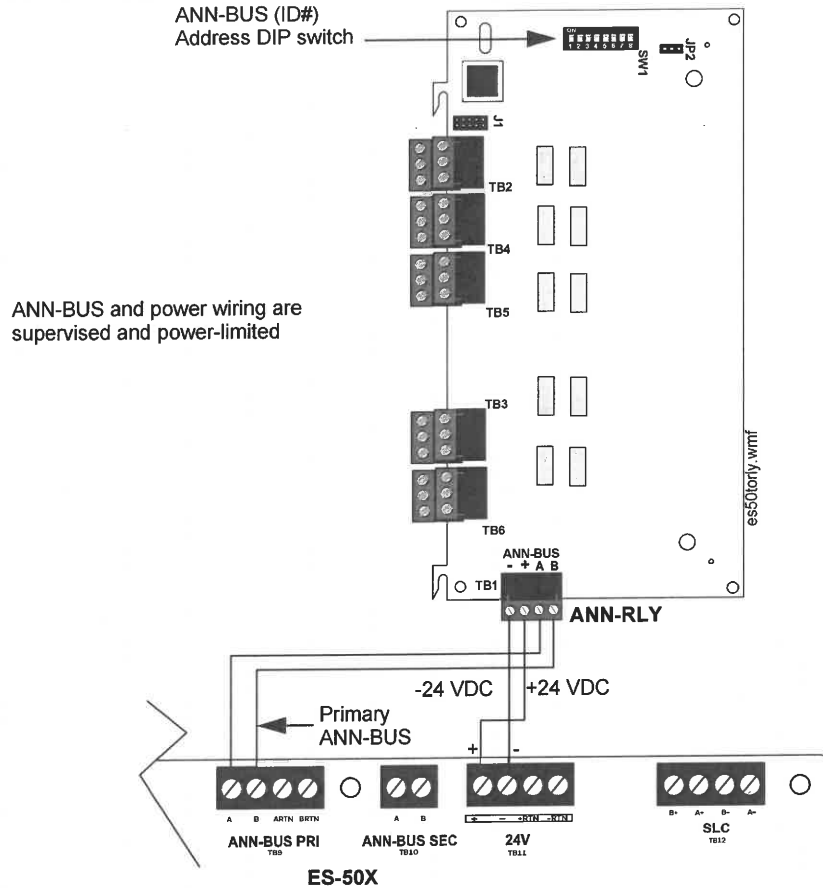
ANN-RLY Board Layout and Connection to FACP
